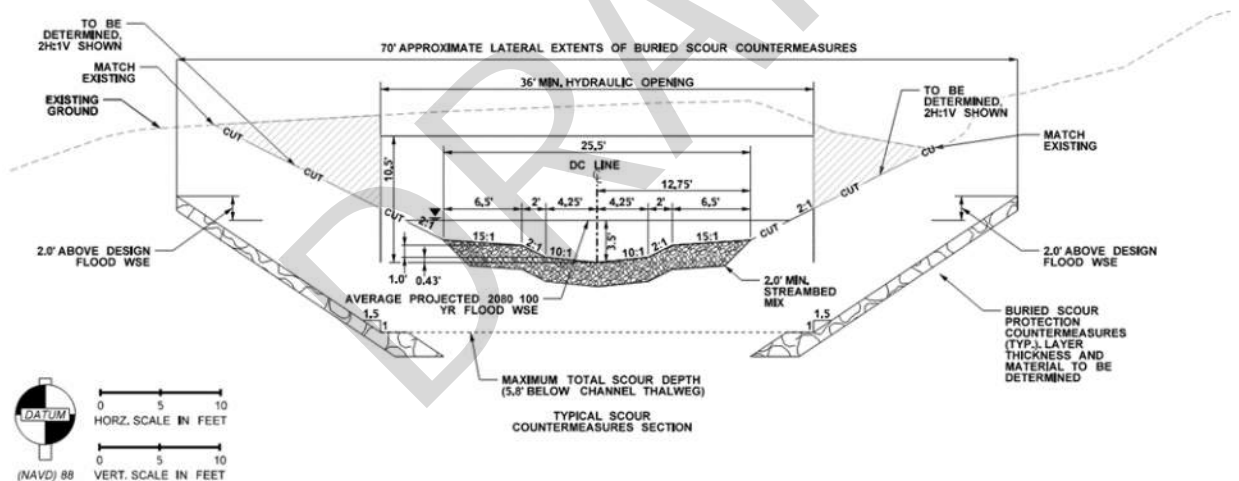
Typical channel design section through proposed crossing showing buried scour countermeasures
